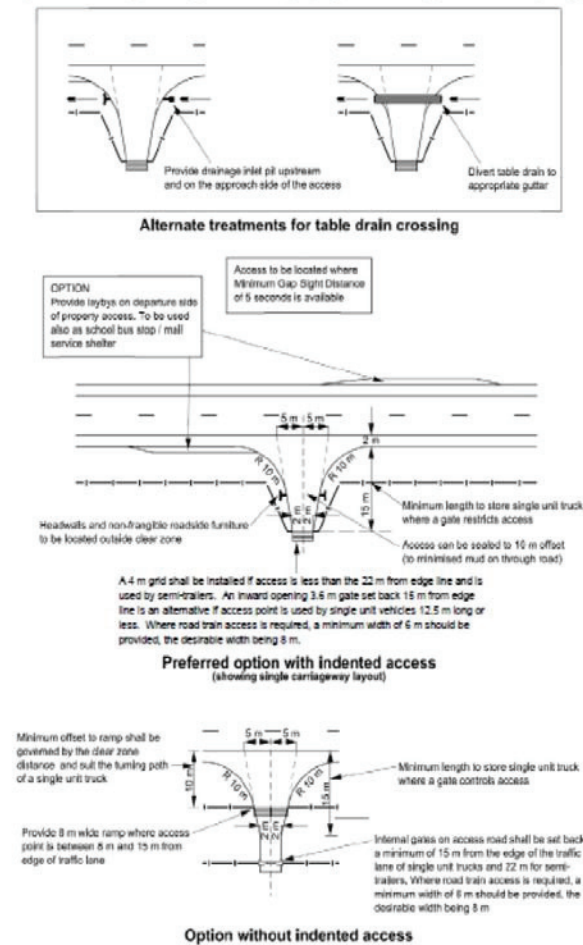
Example of a layout of a rural property access – single or dual carriageway (conditional)
